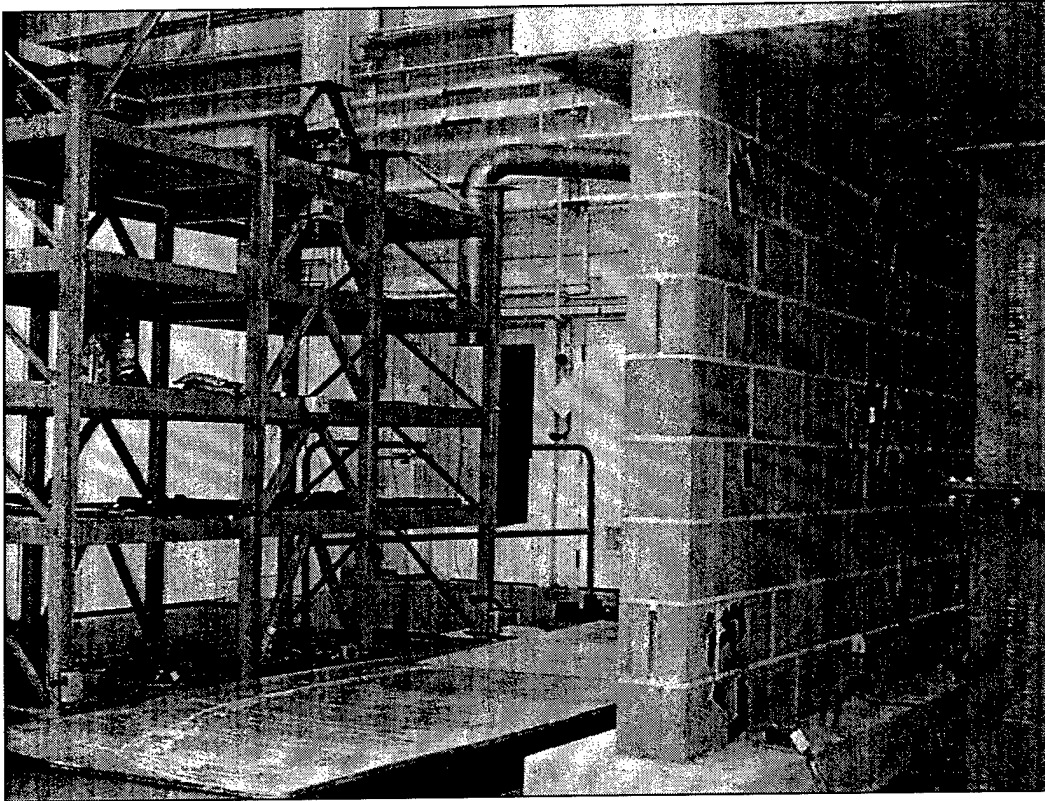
Formation of a crack on the inside of the unprotected wall from Seismic Test EQ-1, inside view.
